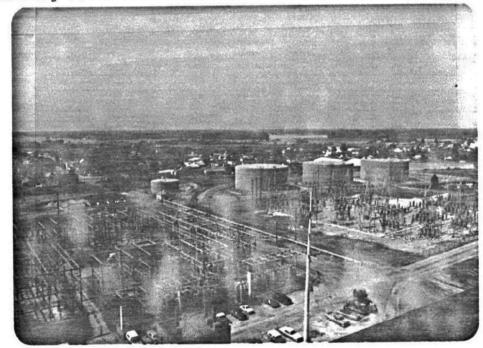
View from the roof of Boiler 8 facing southwest showing the electrical substation and the oil storage facilities.
